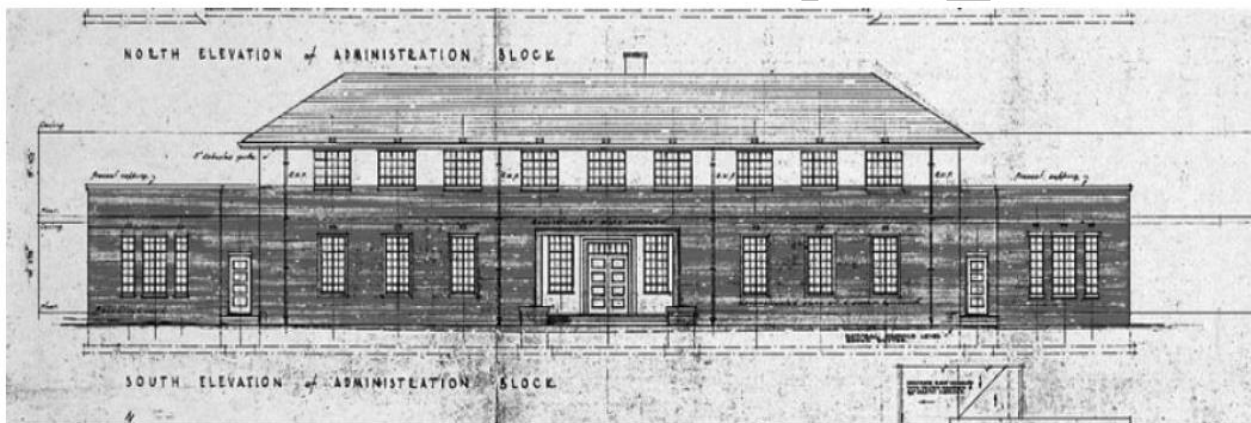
The original building plan (south evaluation for the administration building on Stikland North (Low 2019)
